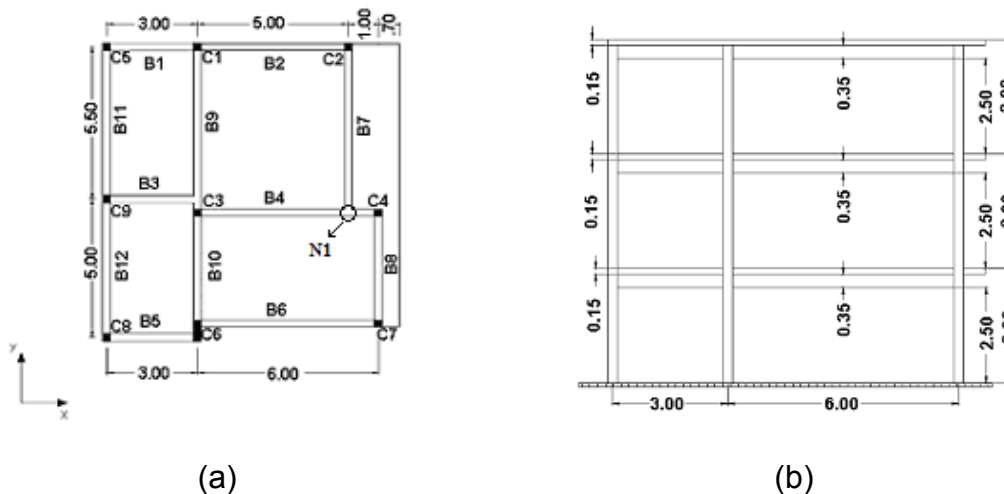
Building configuration: (a) in plan, (b) at the south west facade (units meters).
